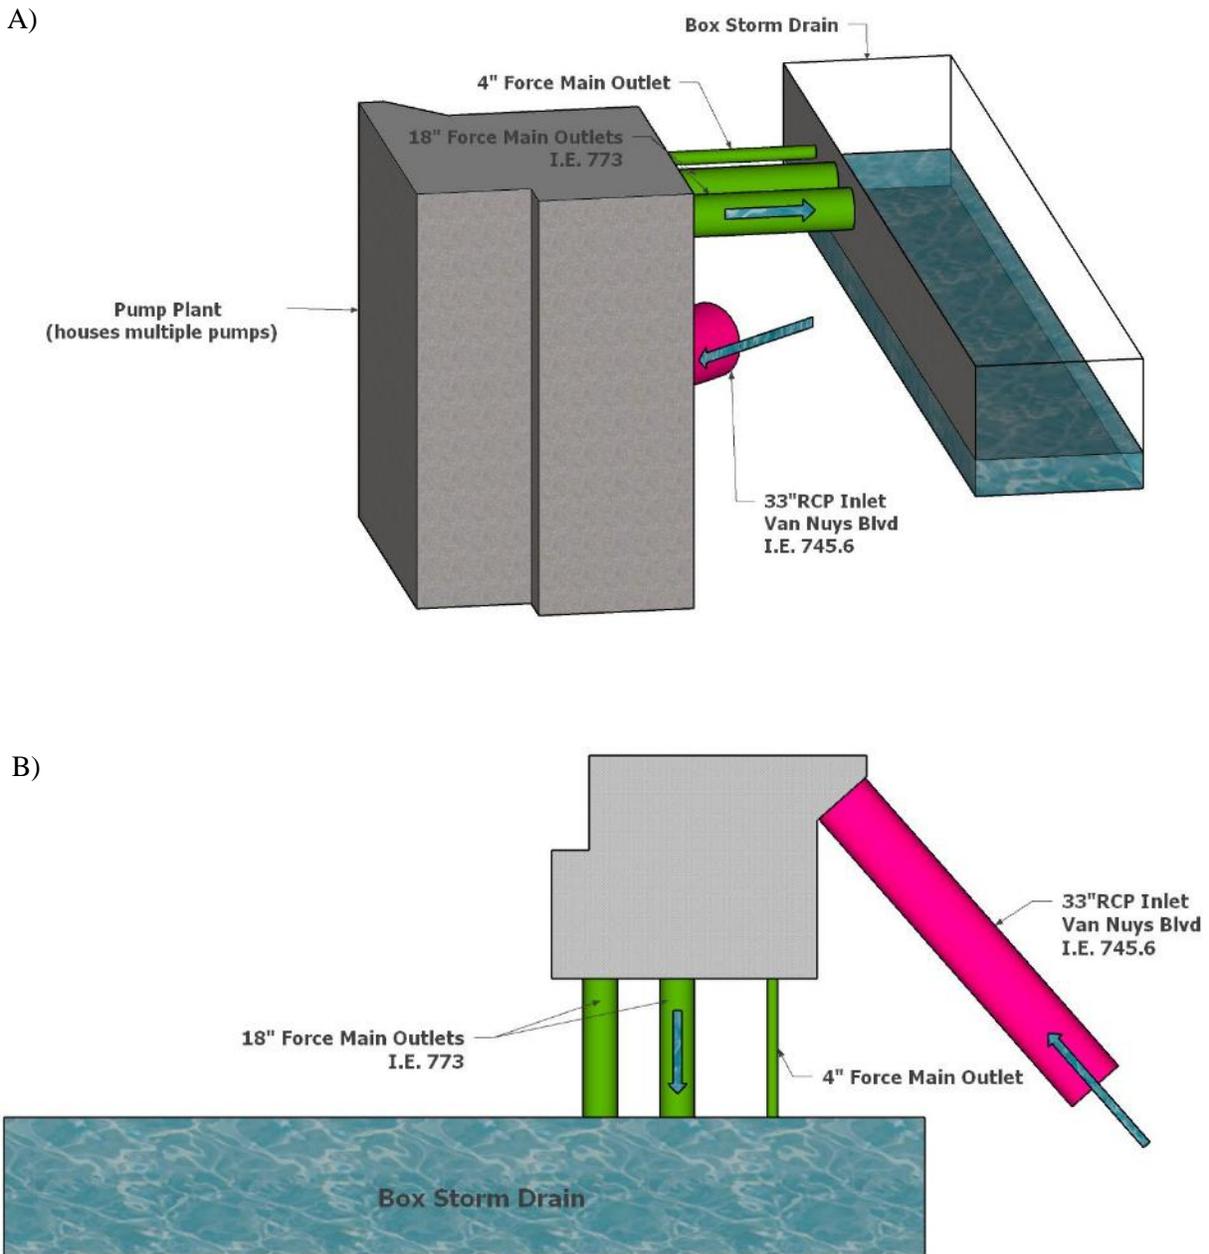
A) Isometric Configuration of Pump Plant 621. B) Plan Configuration of Pump Plant 621.
